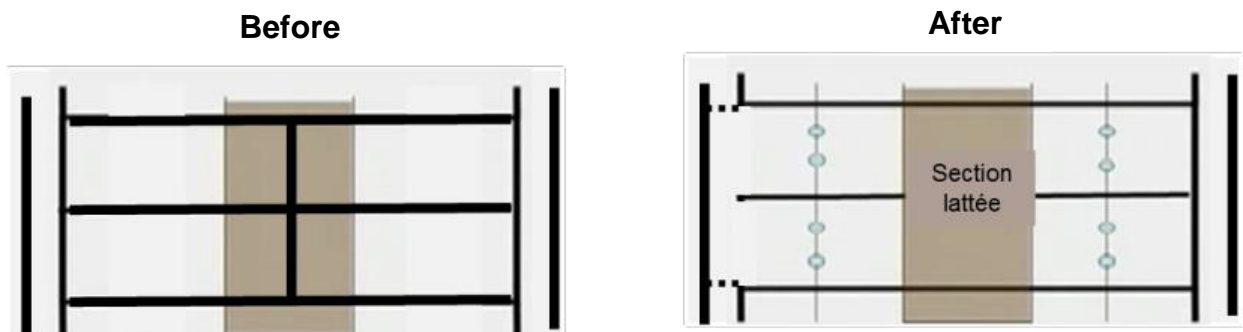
Conversion of a finishing operation with outside passageways to a floor feeding system for group-housed sows
